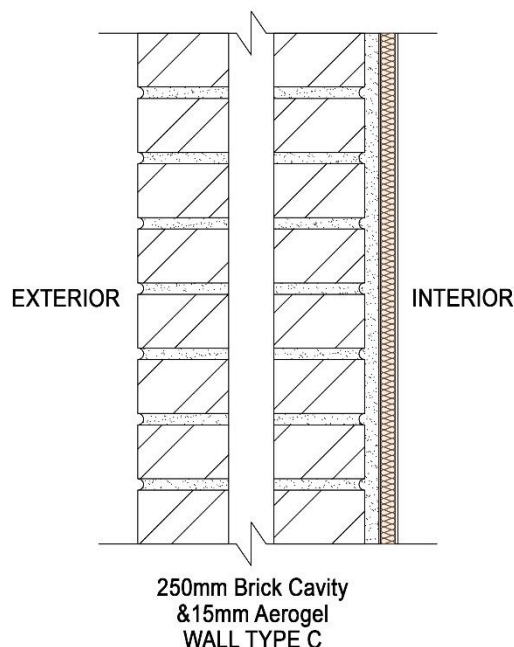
Typical section through a brick cavity wall (hybrid wall)
